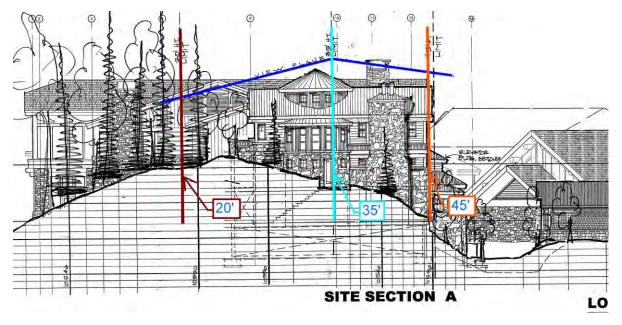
The Ridge Master Plan 2008 DRB Approved Sketch Plan, Sheet A-3.3
